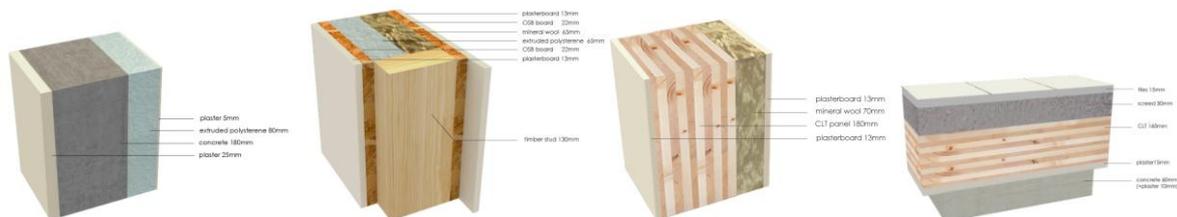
Existing case wall Fig. 10 Timber frame wall Fig. 11CLTpanel wall Fig. 12. CLT panel with concrete soffits
